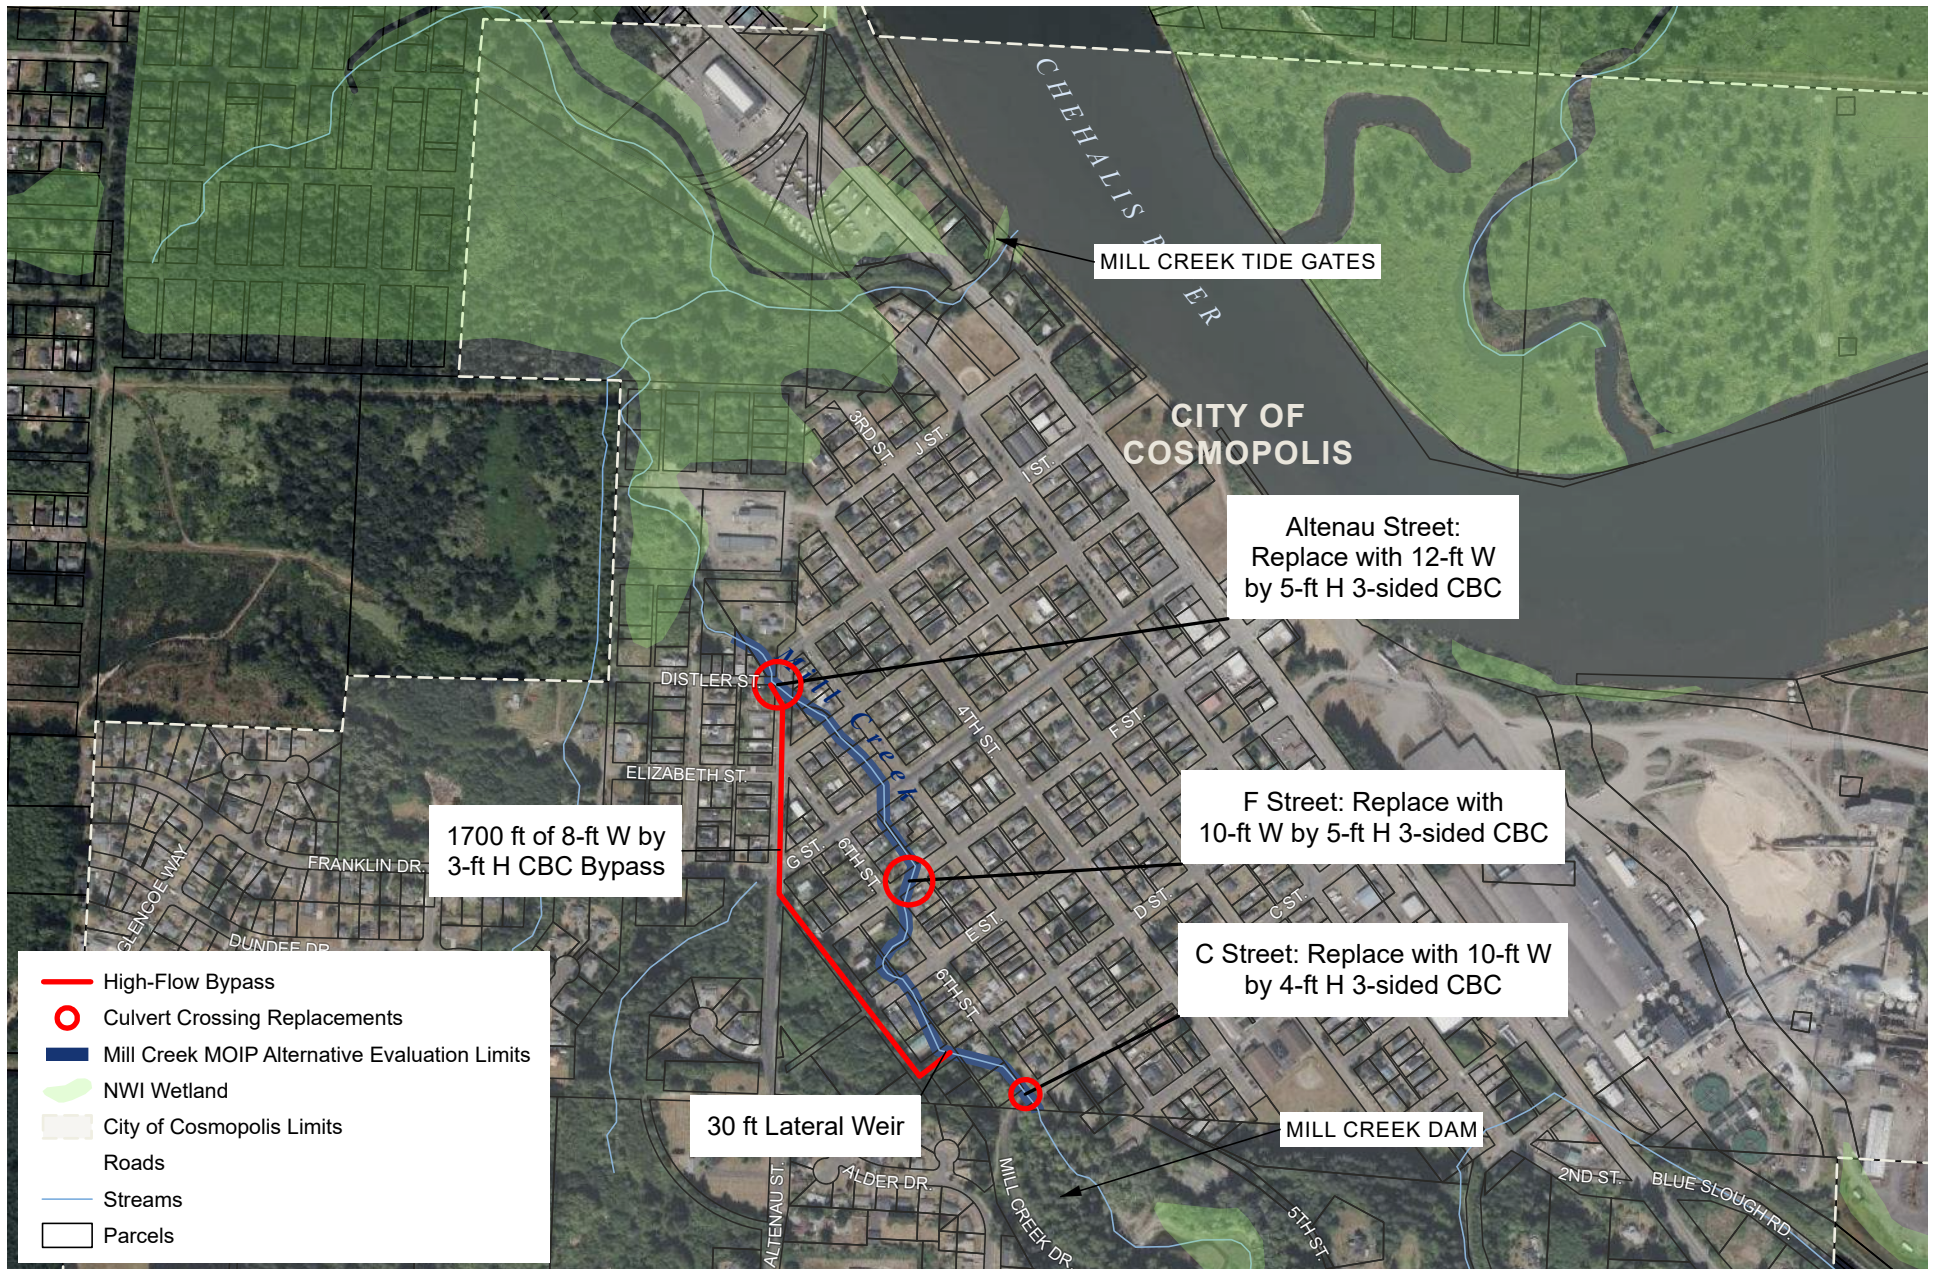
shows the culvert replacement, side channel, and new box culvert storm drain locations. Figure 3-3 shows a conceptual layout of the lateral weir.
